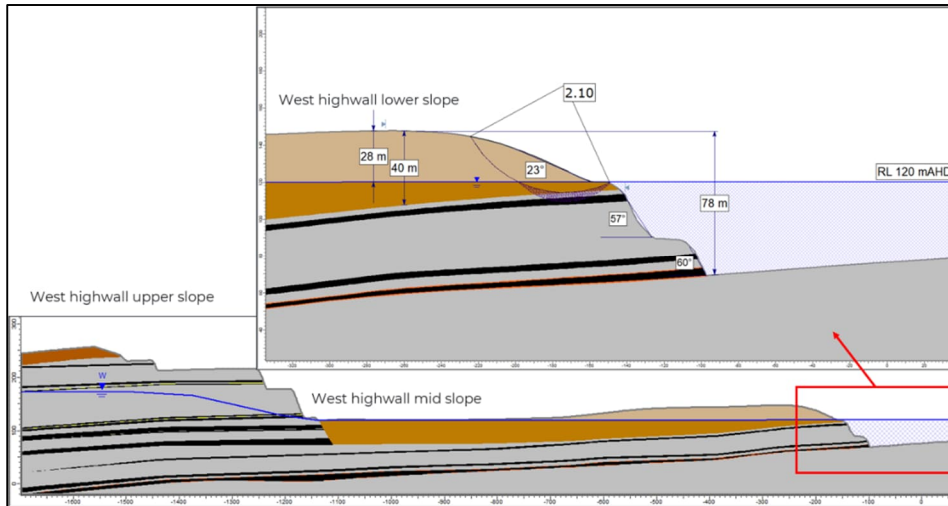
Slope stability model result for Section 1 (North) – West highwall lower slope.
